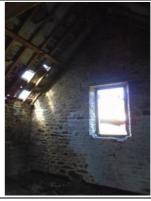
Lodway Farm Building LF1 – the interior is exposed but internal walls are well pointed.
